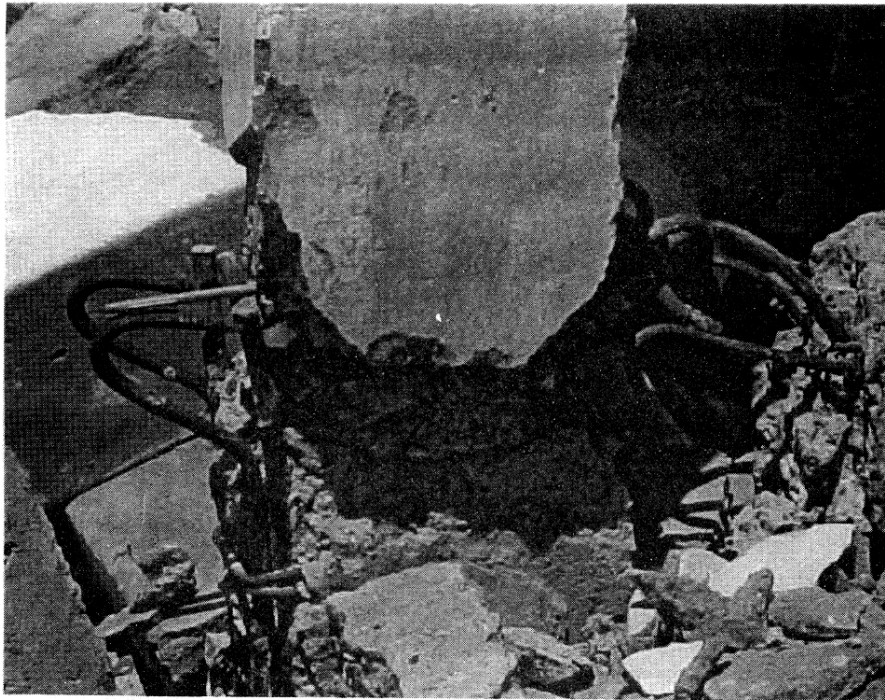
Buckling of longitudinal reinforcement due to large spacing of lateral ties.
